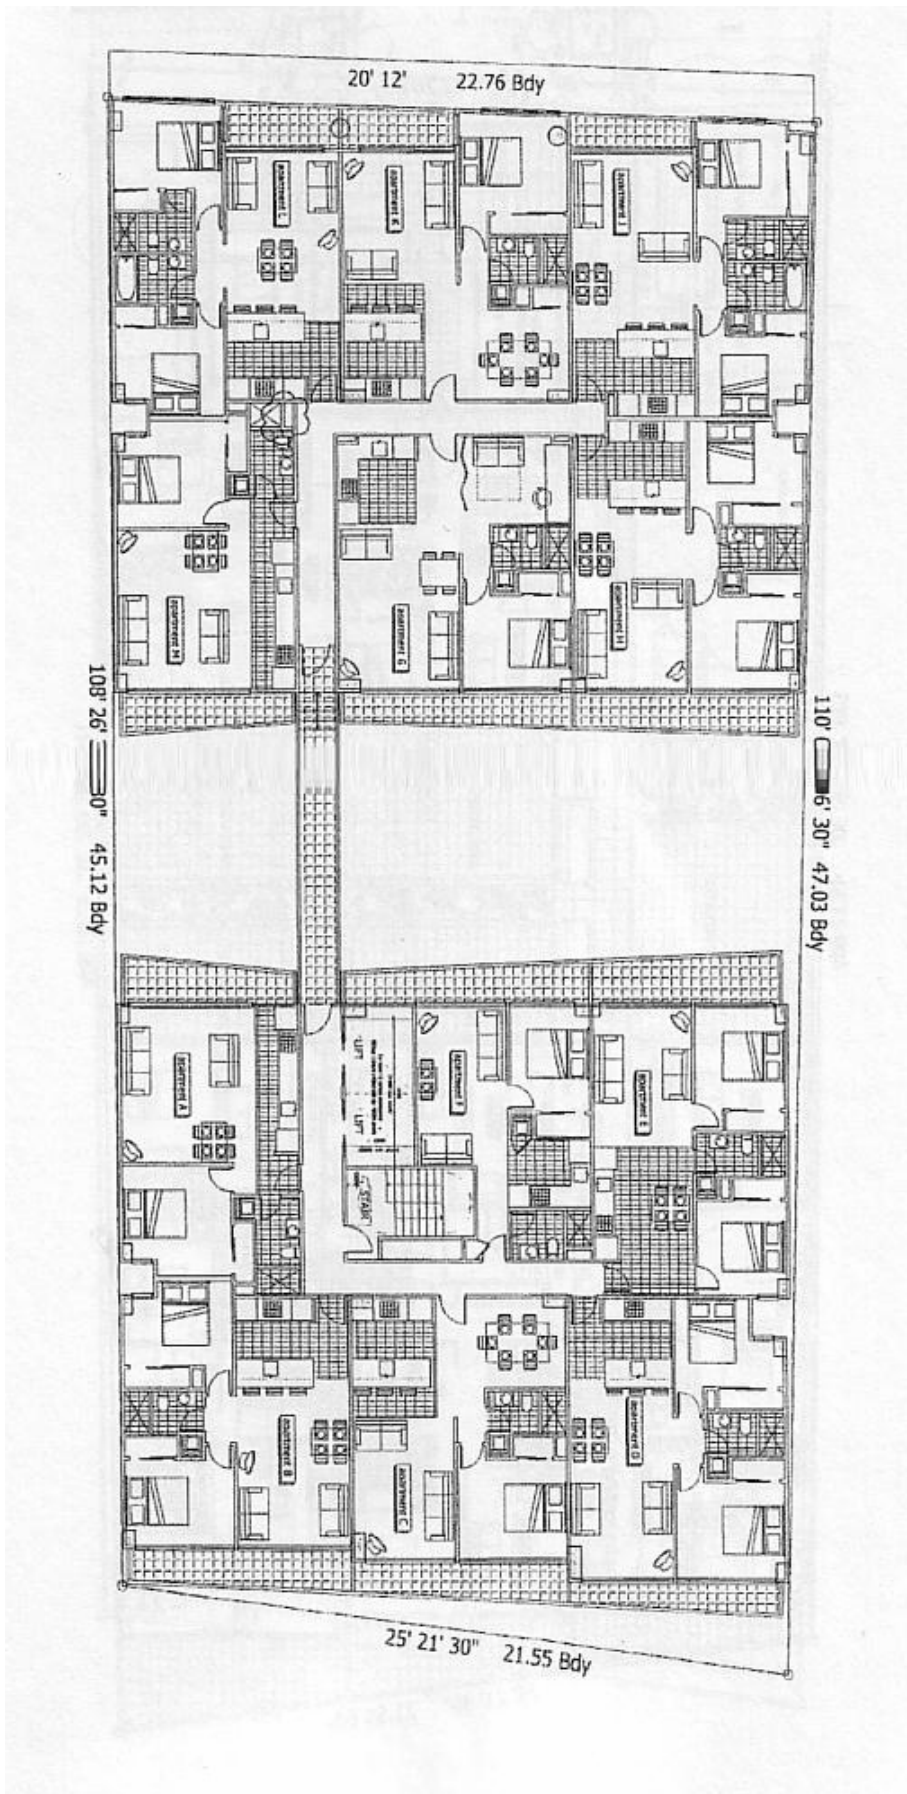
plans, level 1 to 3, reproduced from the architectural plan TP_02 rev G, dated 09.08.04
